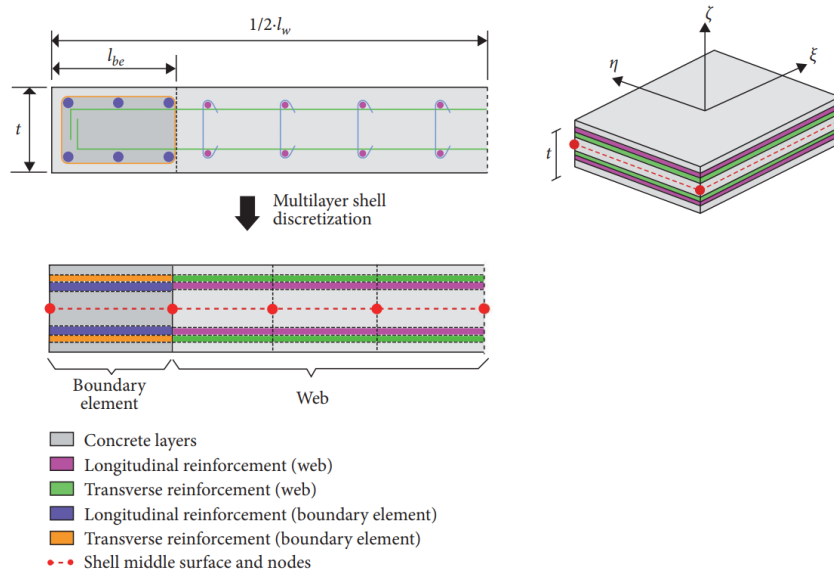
RC Shear Wall Modeling Using Multilayer Shell Element [7]
